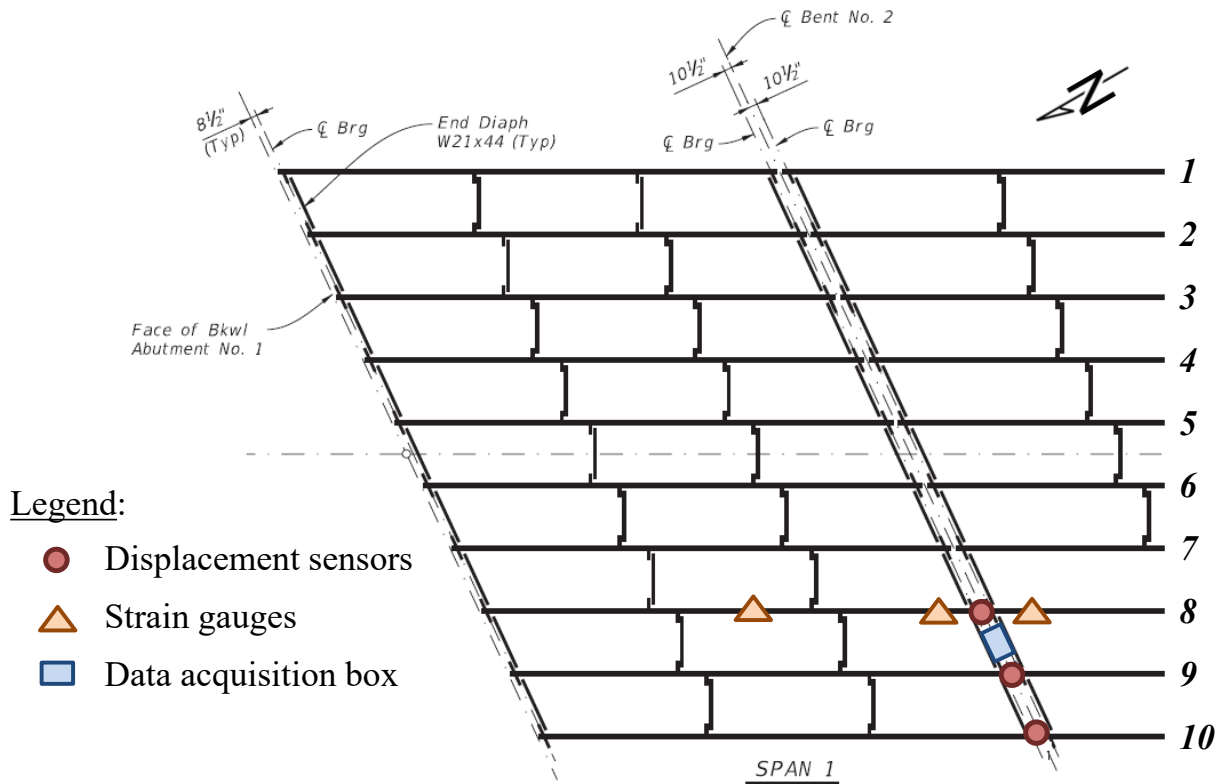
Instrumentation Plan for the I-635 Bridge.
